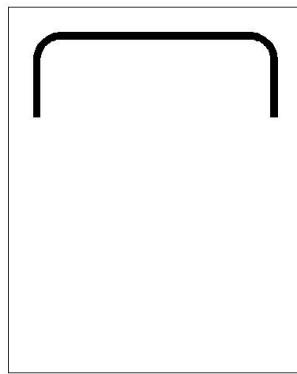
3 Outer Cap Stirrup Bend Type
